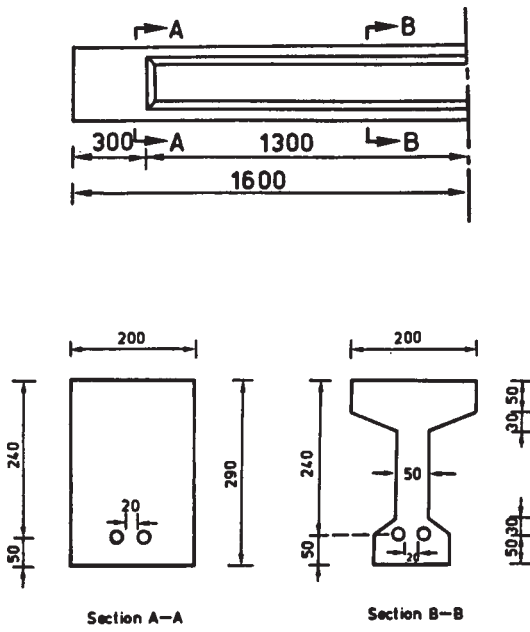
Design details of a typical RC T-beam tested under six-point loading.
